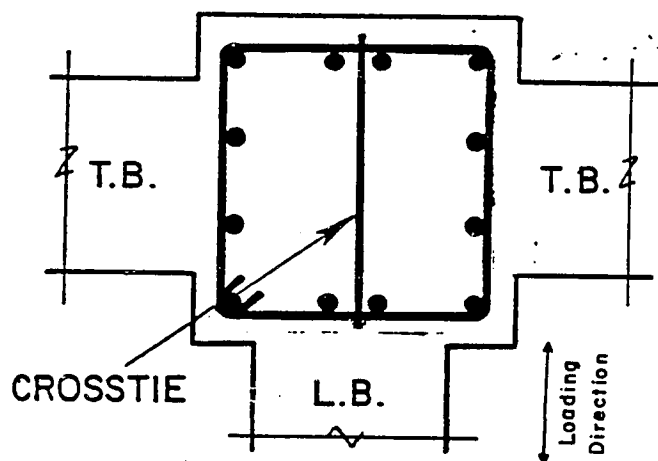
Cross ties in the joint, exterior modified specimen
